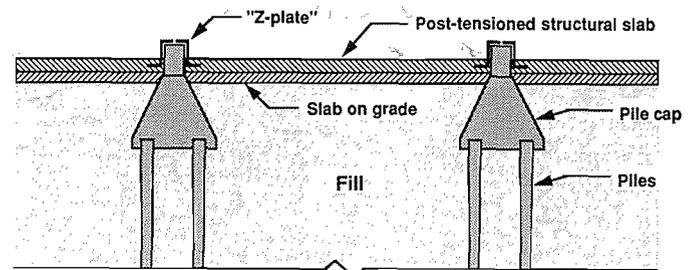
Post-tensioned structural slab and "Z-plate" connection to pile cap.
